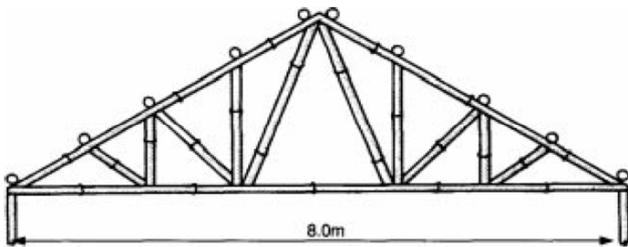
Janssen bamboo roof truss configuration (Source: Janssen, 1995).
